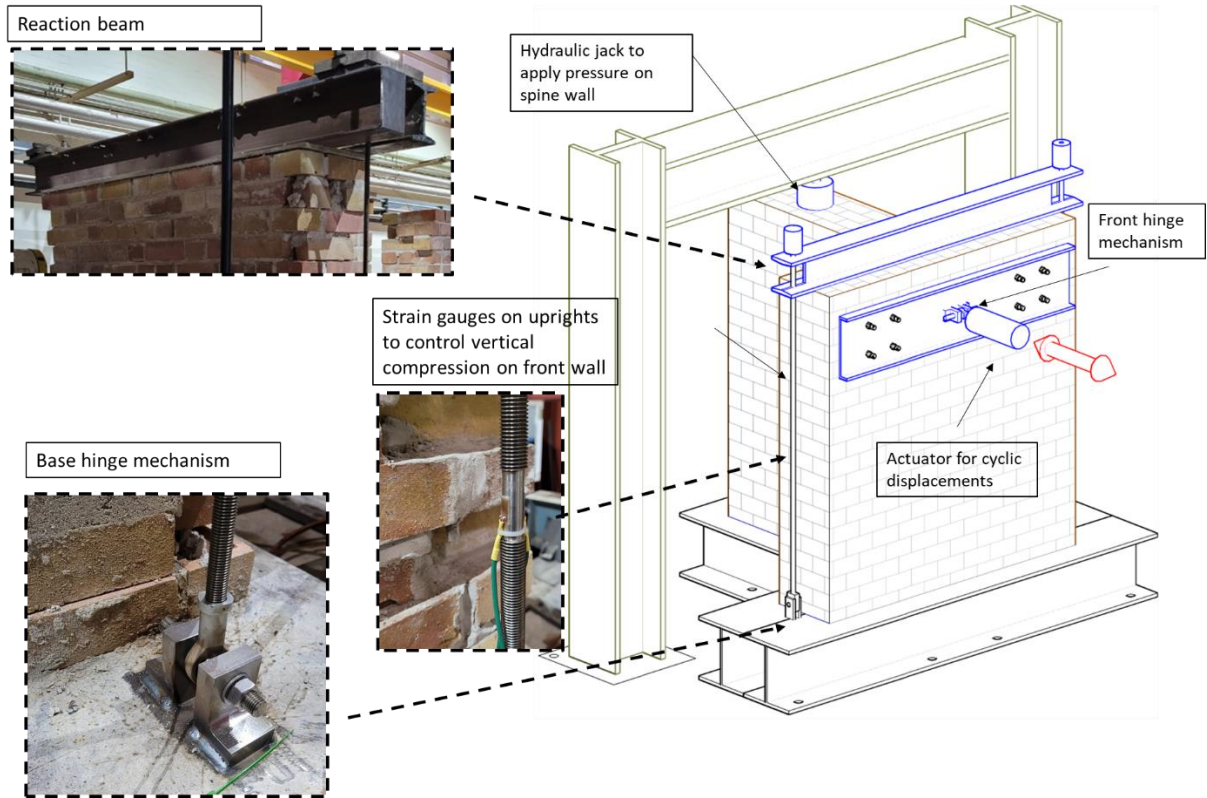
Testing set-up for cyclic loading of T-shaped wall
